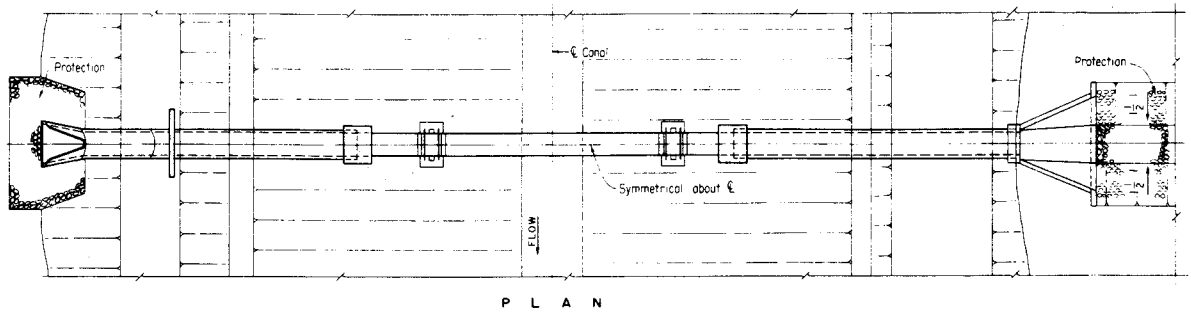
Overchutes—typical plan and sections. 103-D-1308
